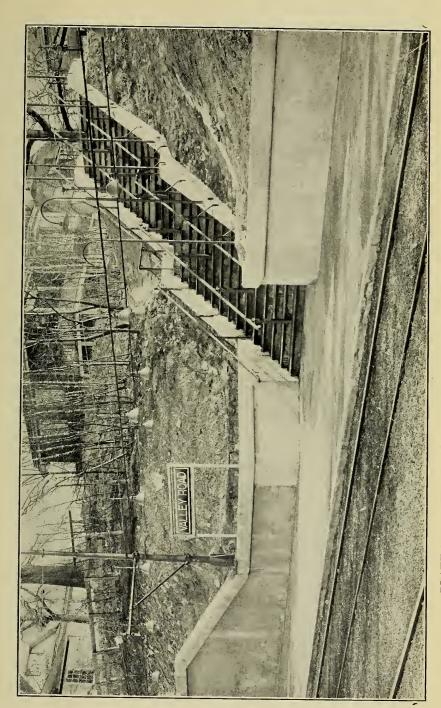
PLATE X.—VALLEY ROAD STATION, AND STAIRWAY FROM ELIOT STREET.
